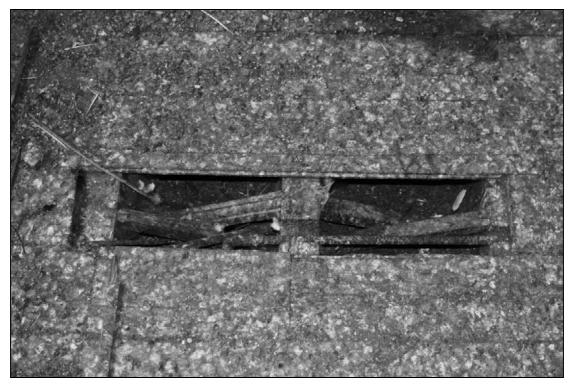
Detail of noggins between timber floor joists, S2 (film 41.24)
